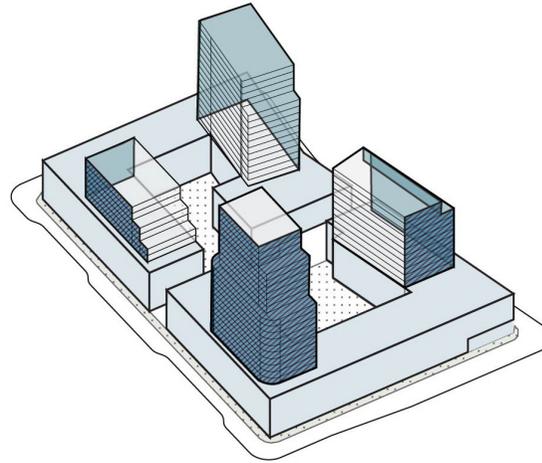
Dwelling Units at Grade in Mid-Rise Elements, Facing the Street
